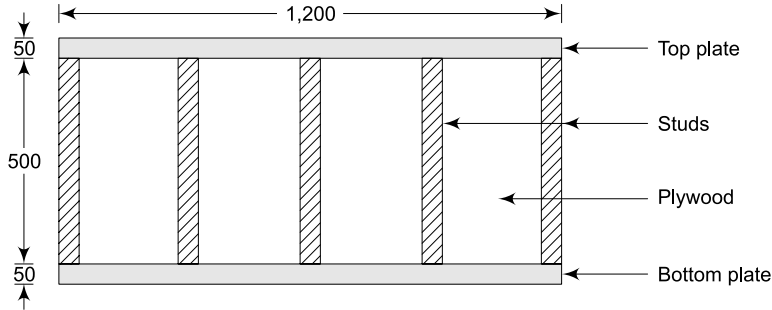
Arrangement of Studs and Plate in One Form Panel.
